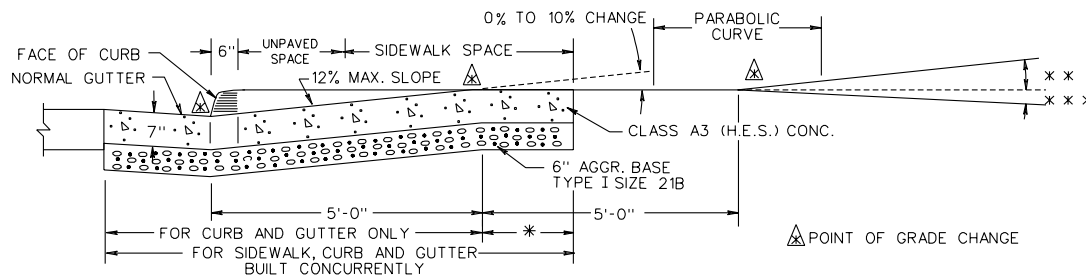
DETAIL TO BE USED WHEN THE COMBINED WIDTH OF UNPAVED SPACE AND SIDEWALK SPACE IS LESS THAN 7'.
